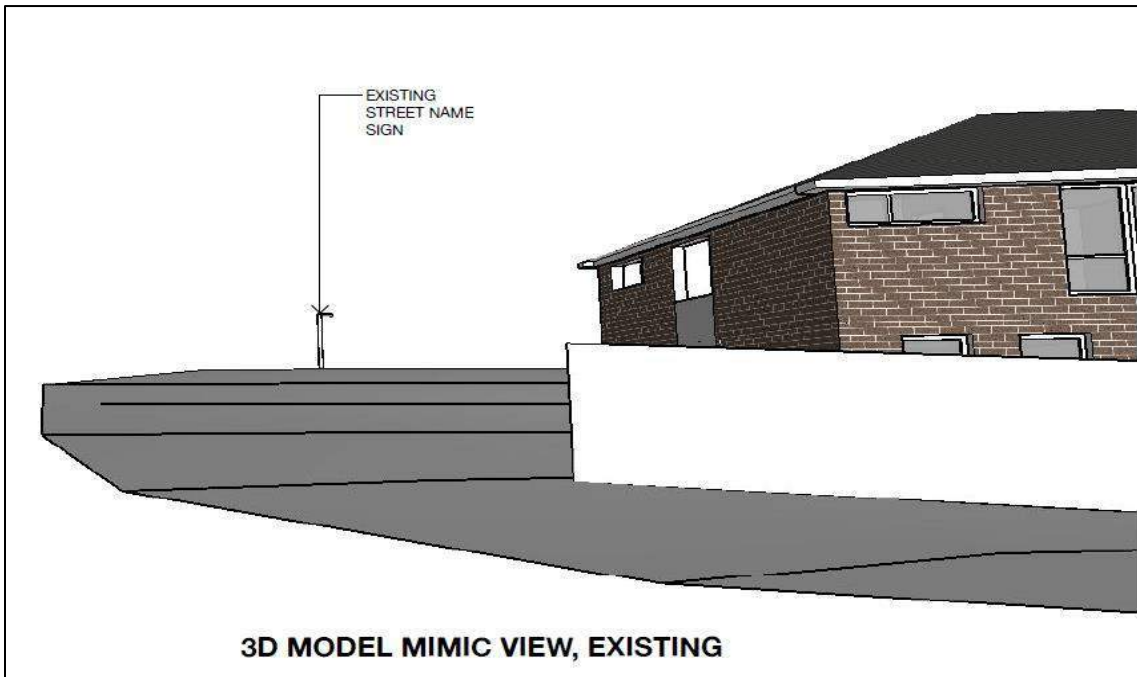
3D Model of the existing view looking north-west towards the intersection of Lomond View Drive and Bordin Street.
